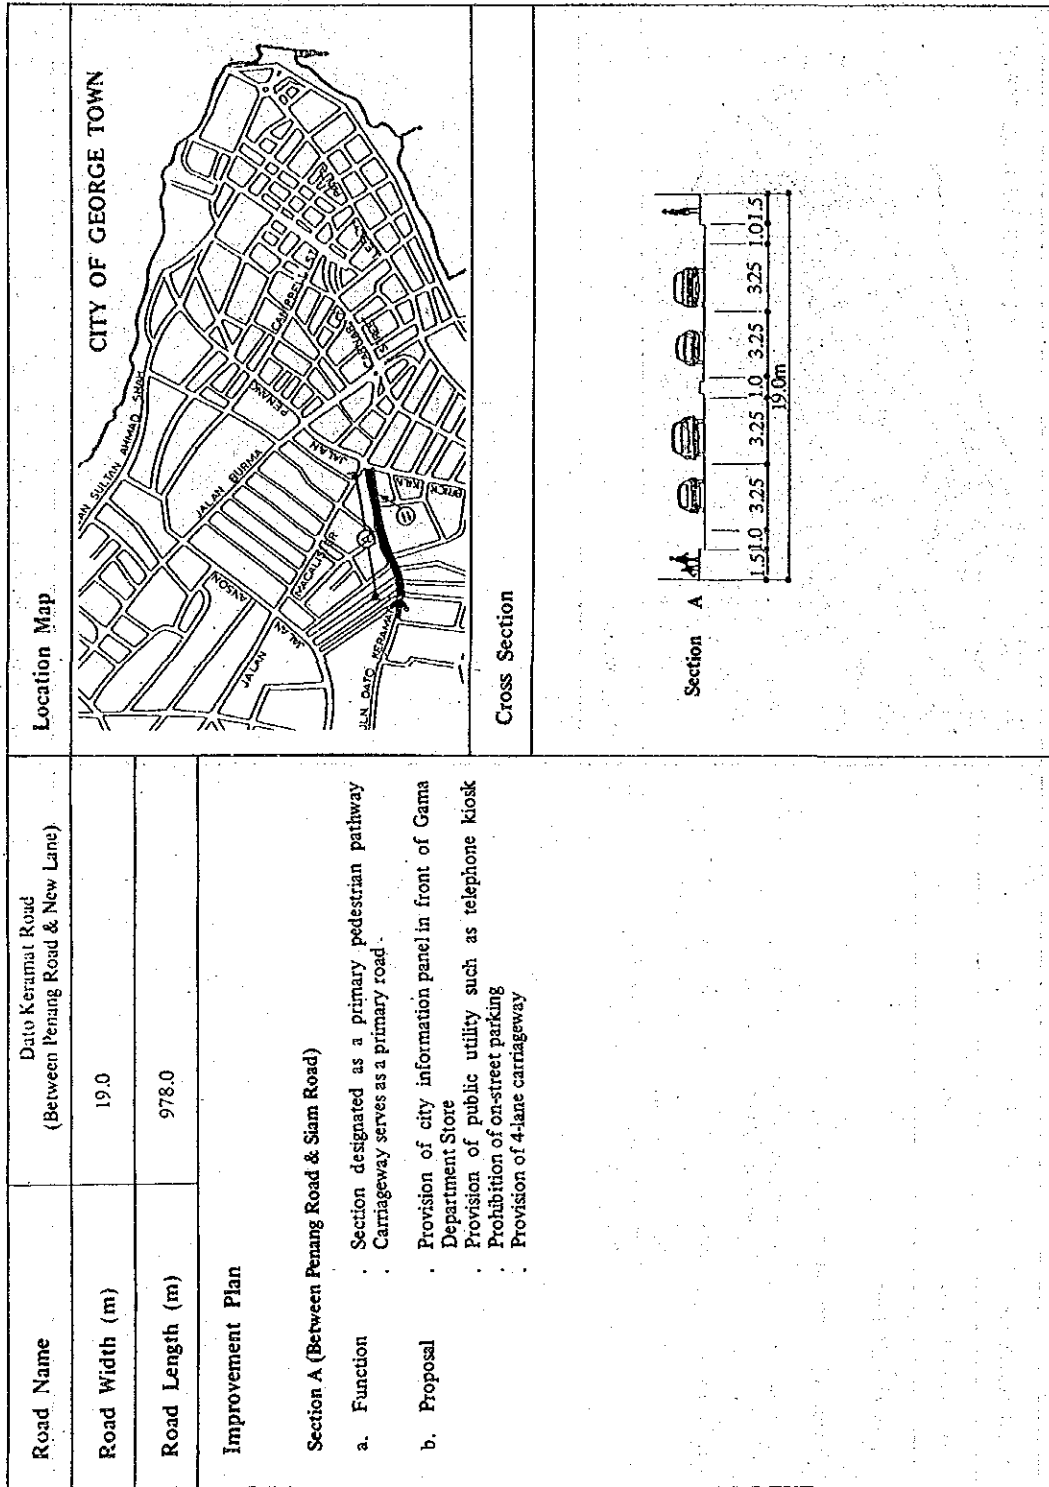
Pedestrianisation Improvement Plan (11) – Dato Keramat Road
